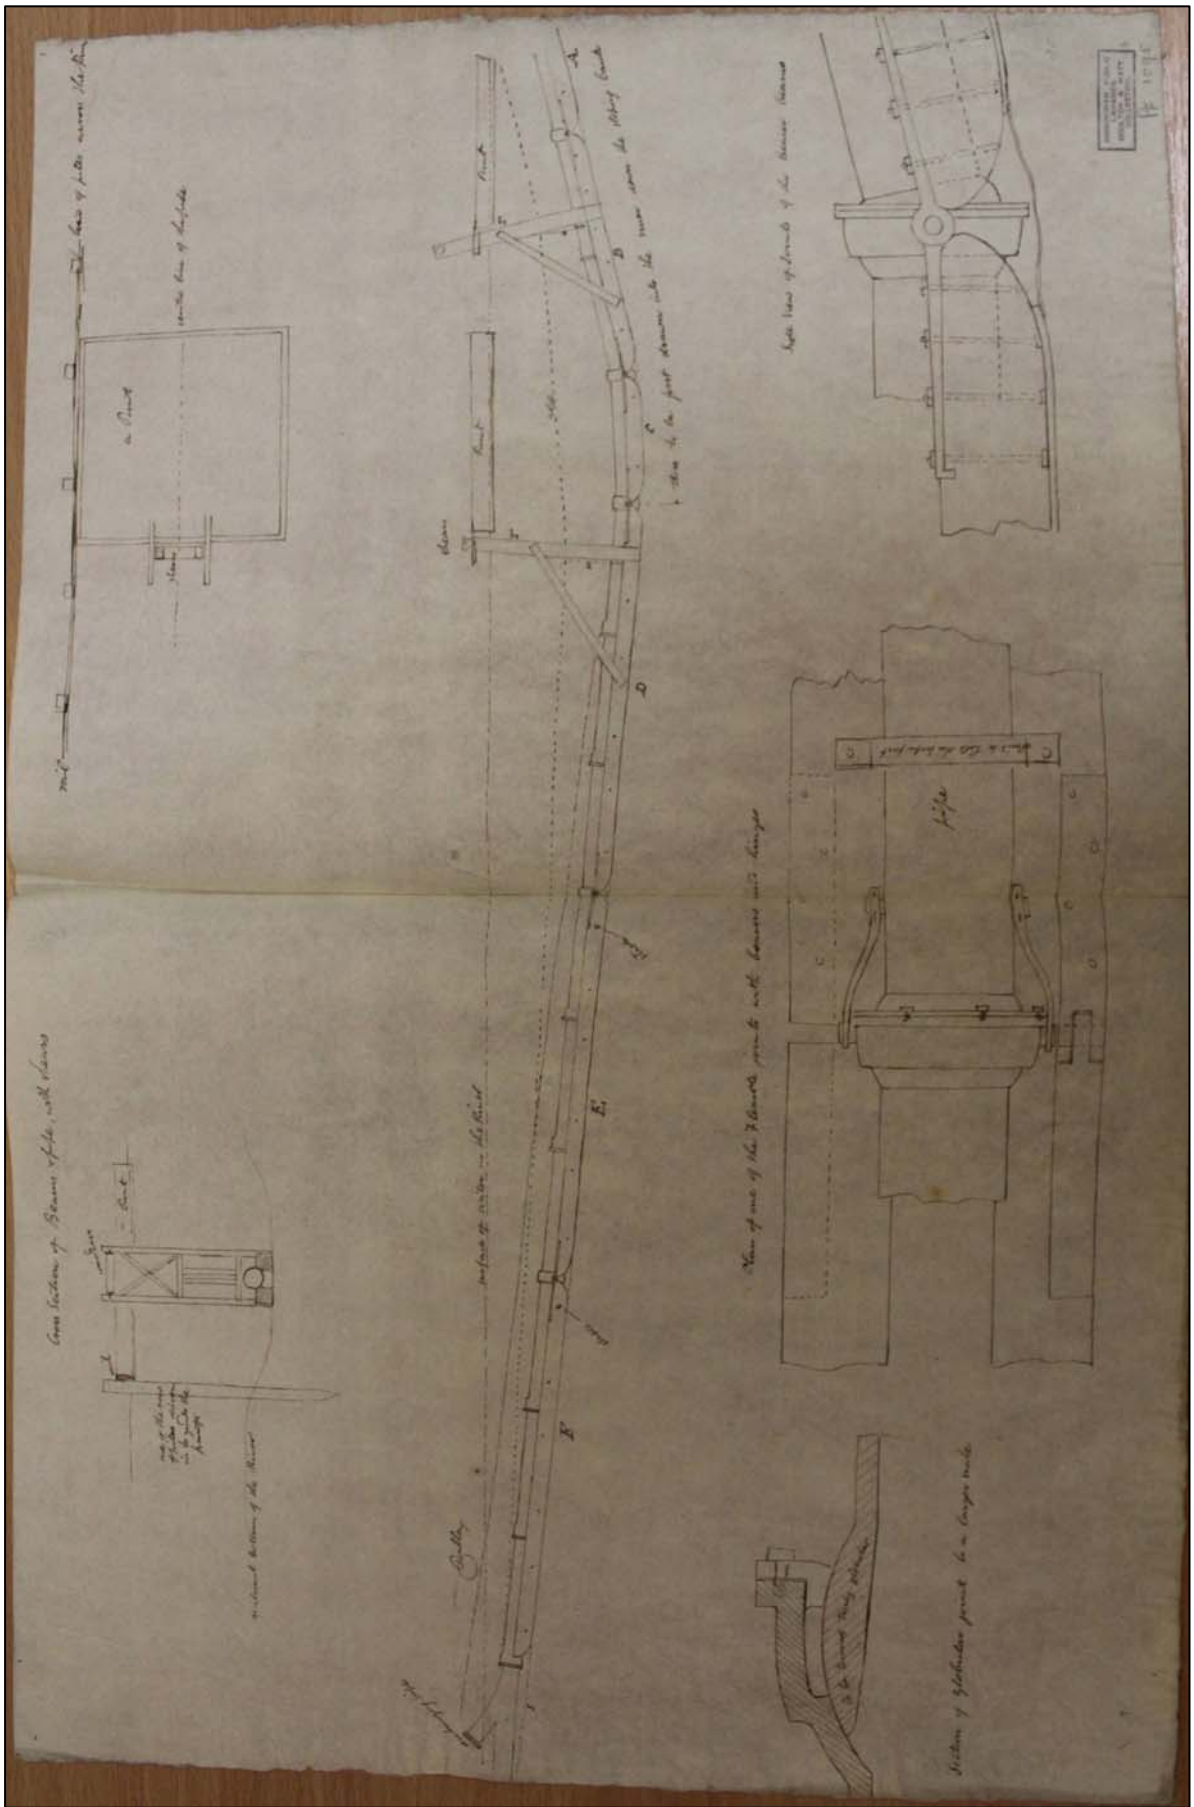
Boulton & Watt Drawing showing construction of Pipeline under River Clyde
